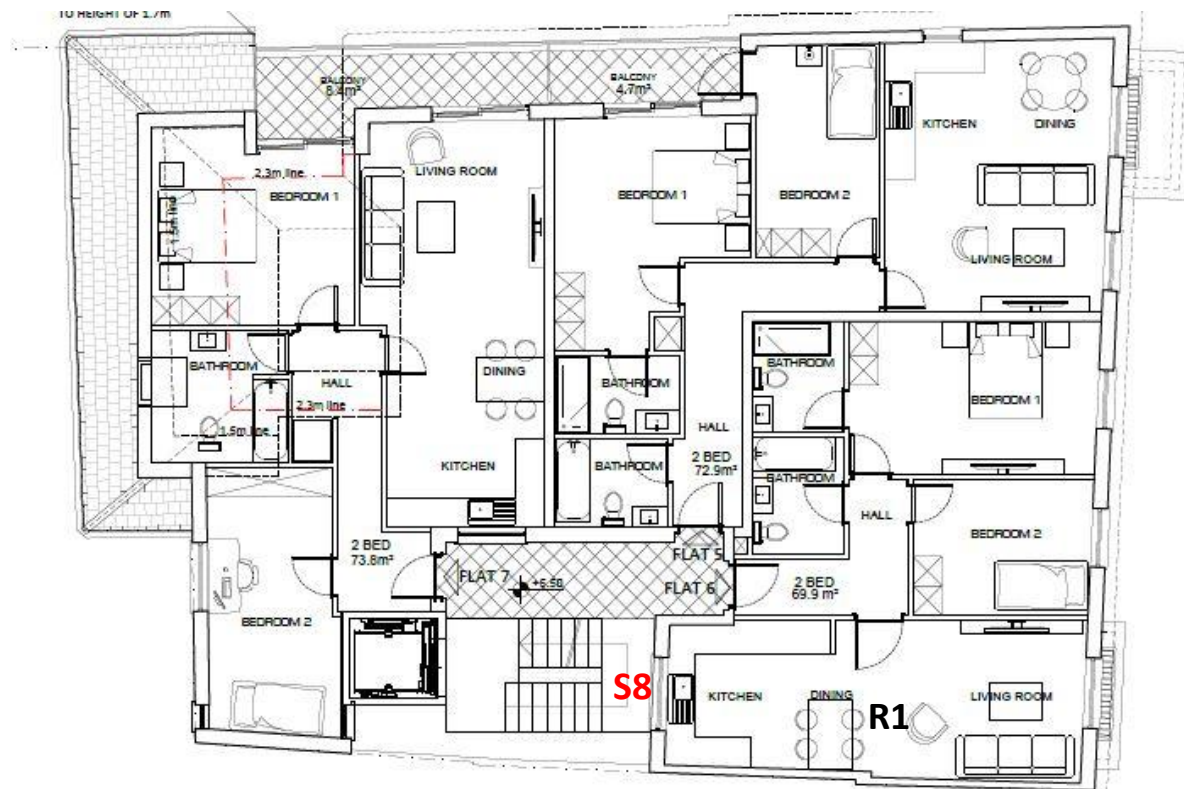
The 2nd floor plan at 5-7 Parson Street (ref. 16/5966/FUL)
